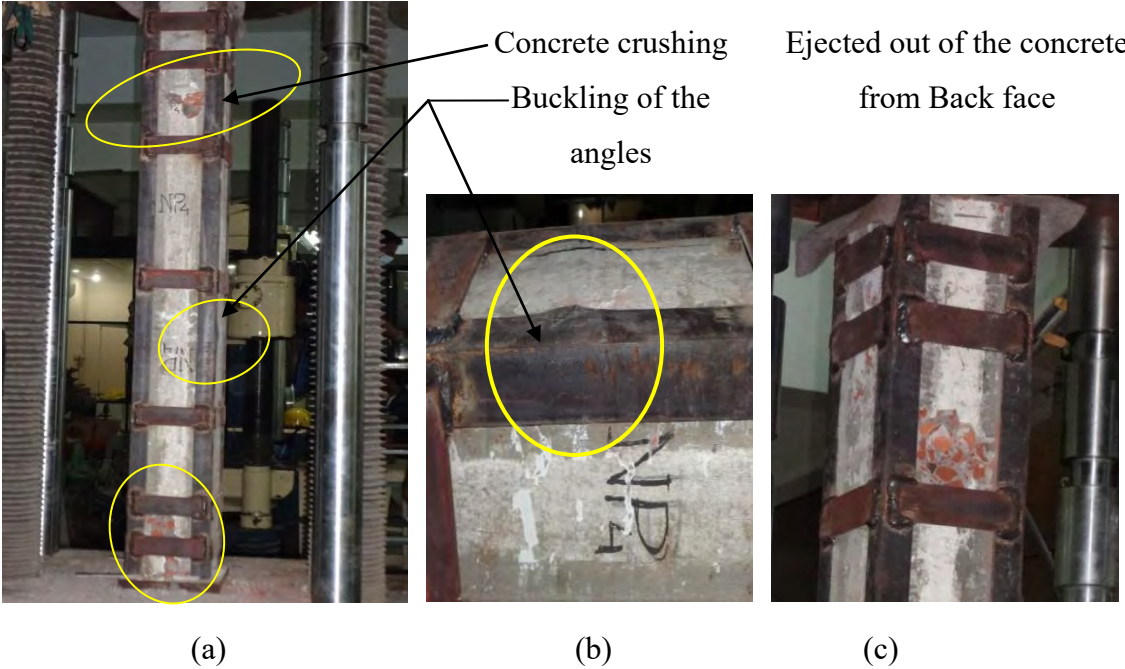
Failure mode of the strengthened RC column NP3.2, (a) Failure shape; and (b) Concrete ejection and buckling of the angles.
